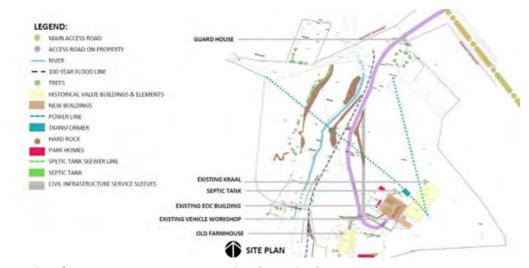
Klerefontein Support Base site plan (Pro Plan)
